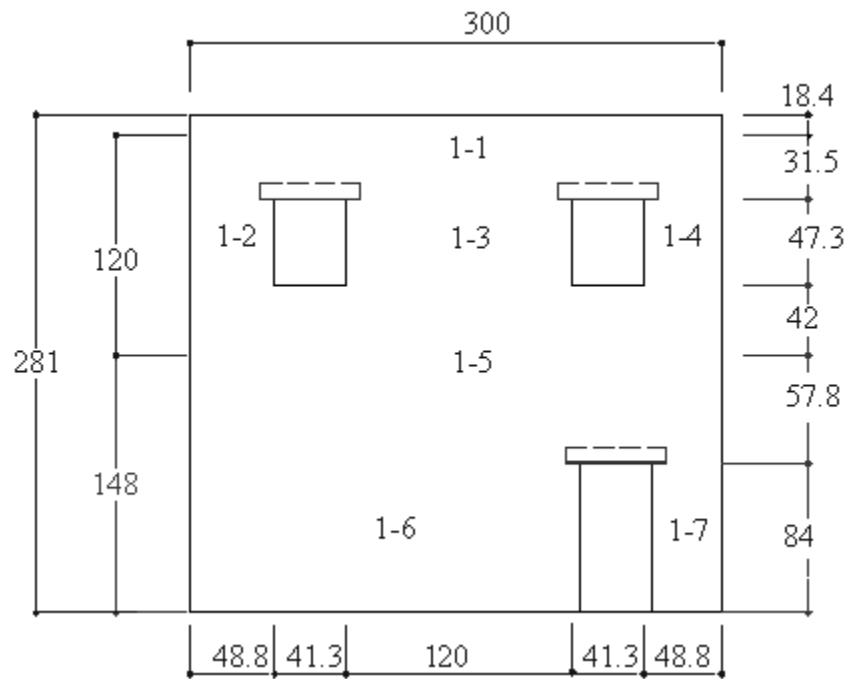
Elevation view of Wall 1 (dimensions are in inches).
